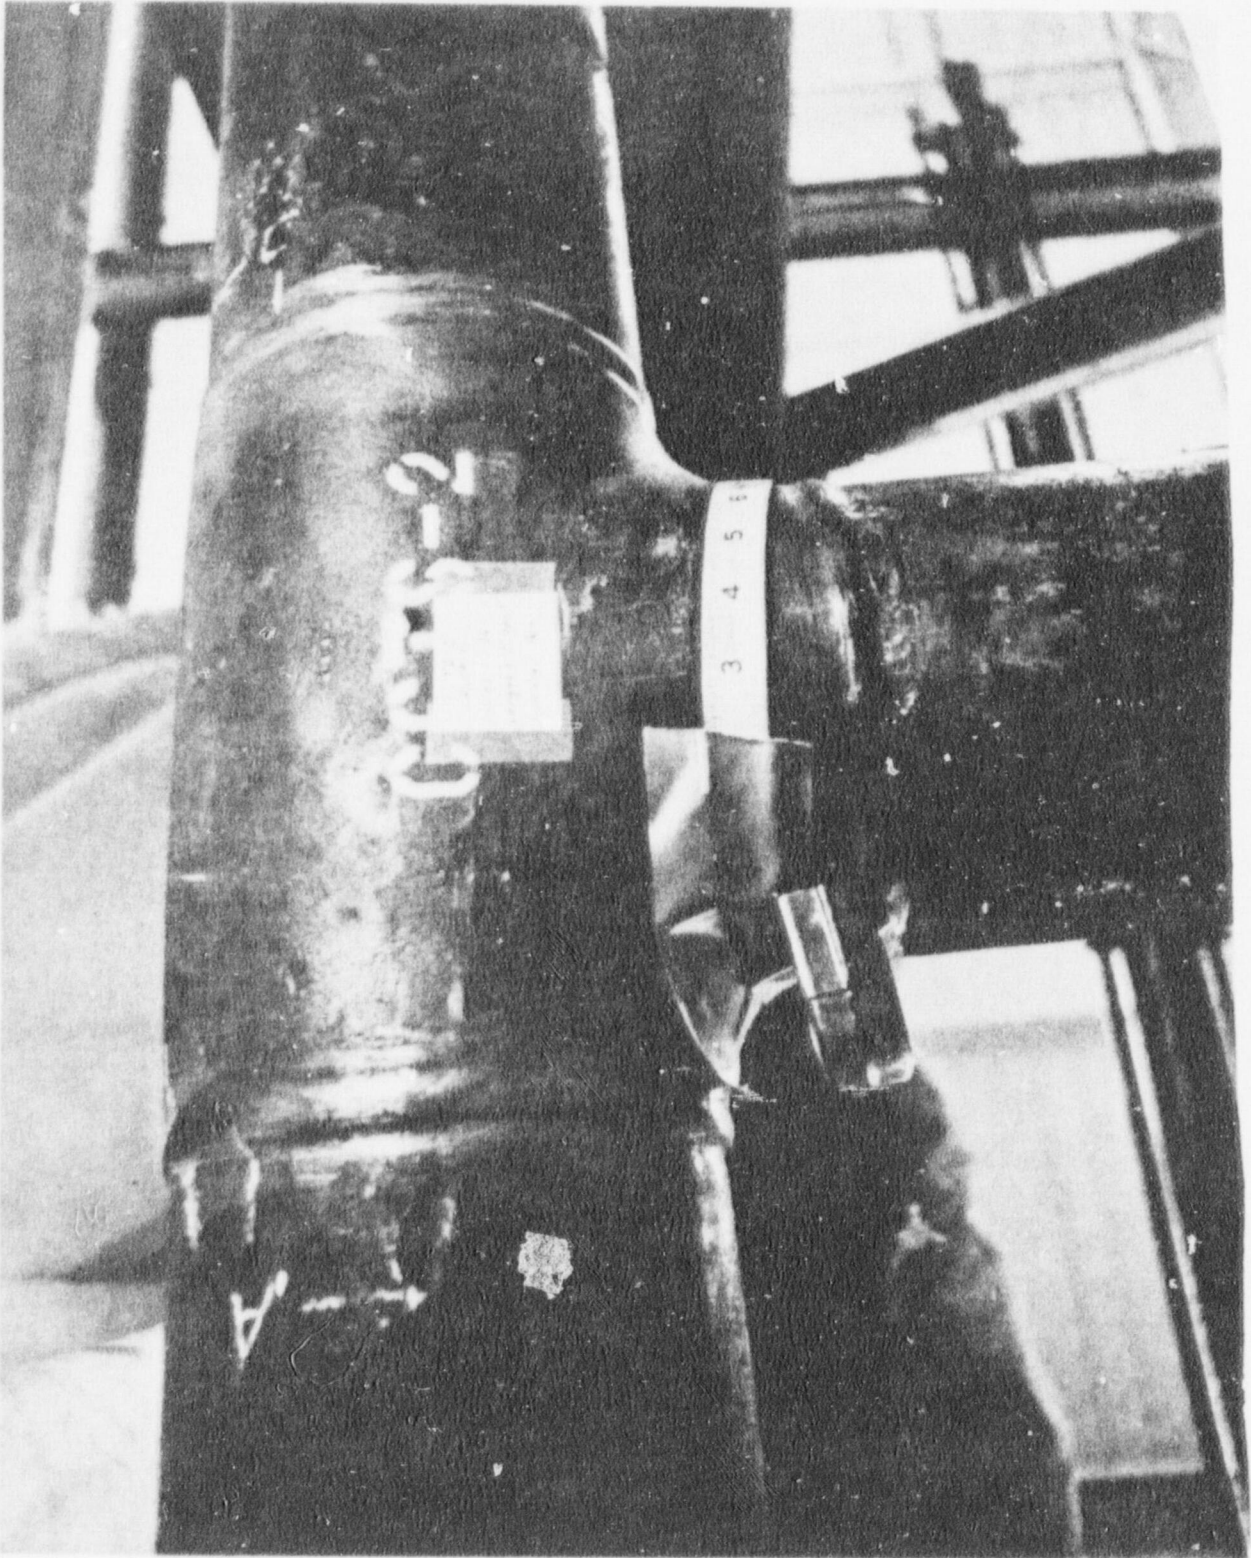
THROUGH WALL PENETRATION, SPECIMEN NO. CCTS-2. VIEW SHOWS
